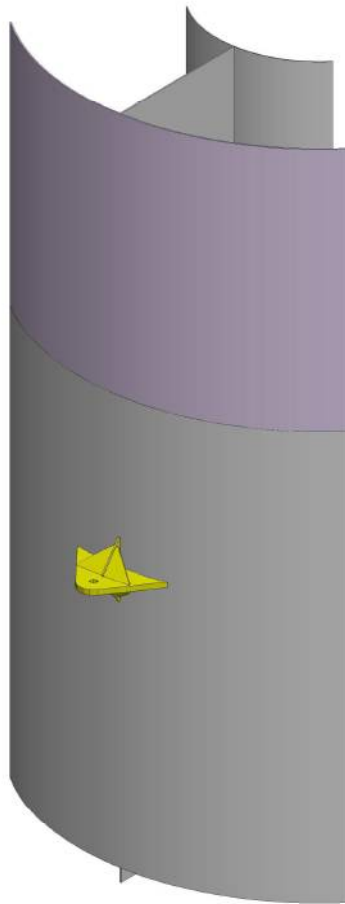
Towing bracket integrated in column wall at height of ring stiffener
